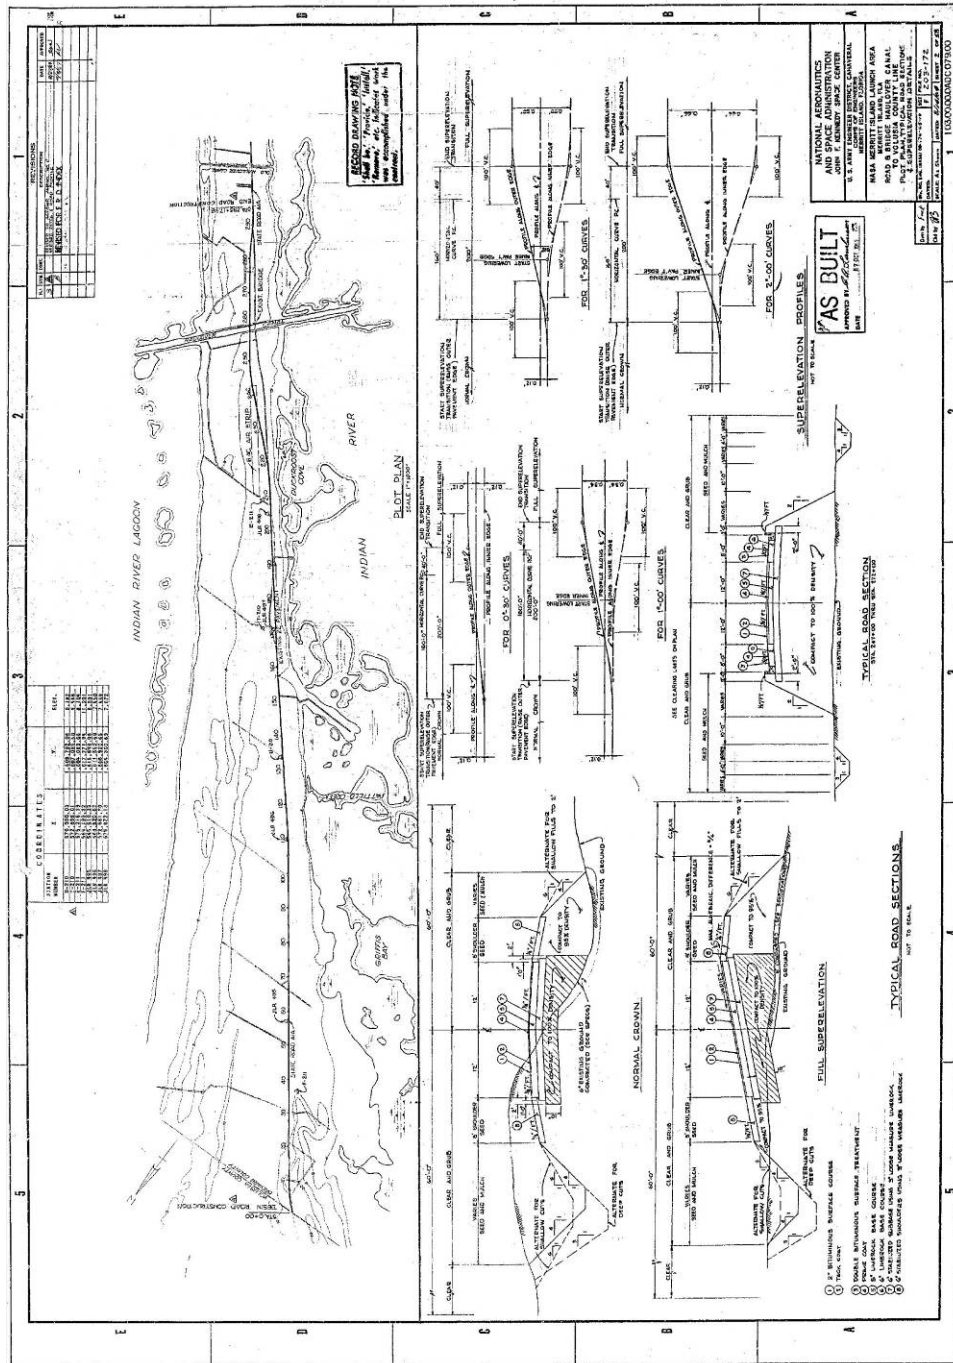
U.S. ACOE, "Plans of Proposed Road and Bridge Haulover Canal (to Volusia County Line)," Plot Plan, Typical Sections & Superelevation Details, August 1964, Sheet 2.
